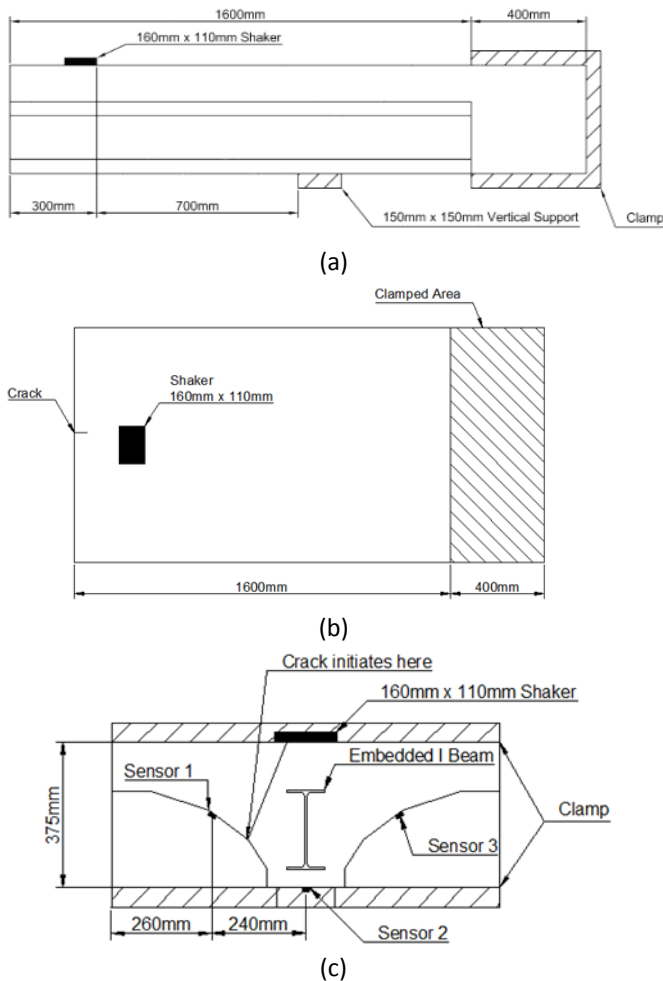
Detailed geometry of the beam section (a) elevation view, (b) plan view and (c) cross sectional view.
